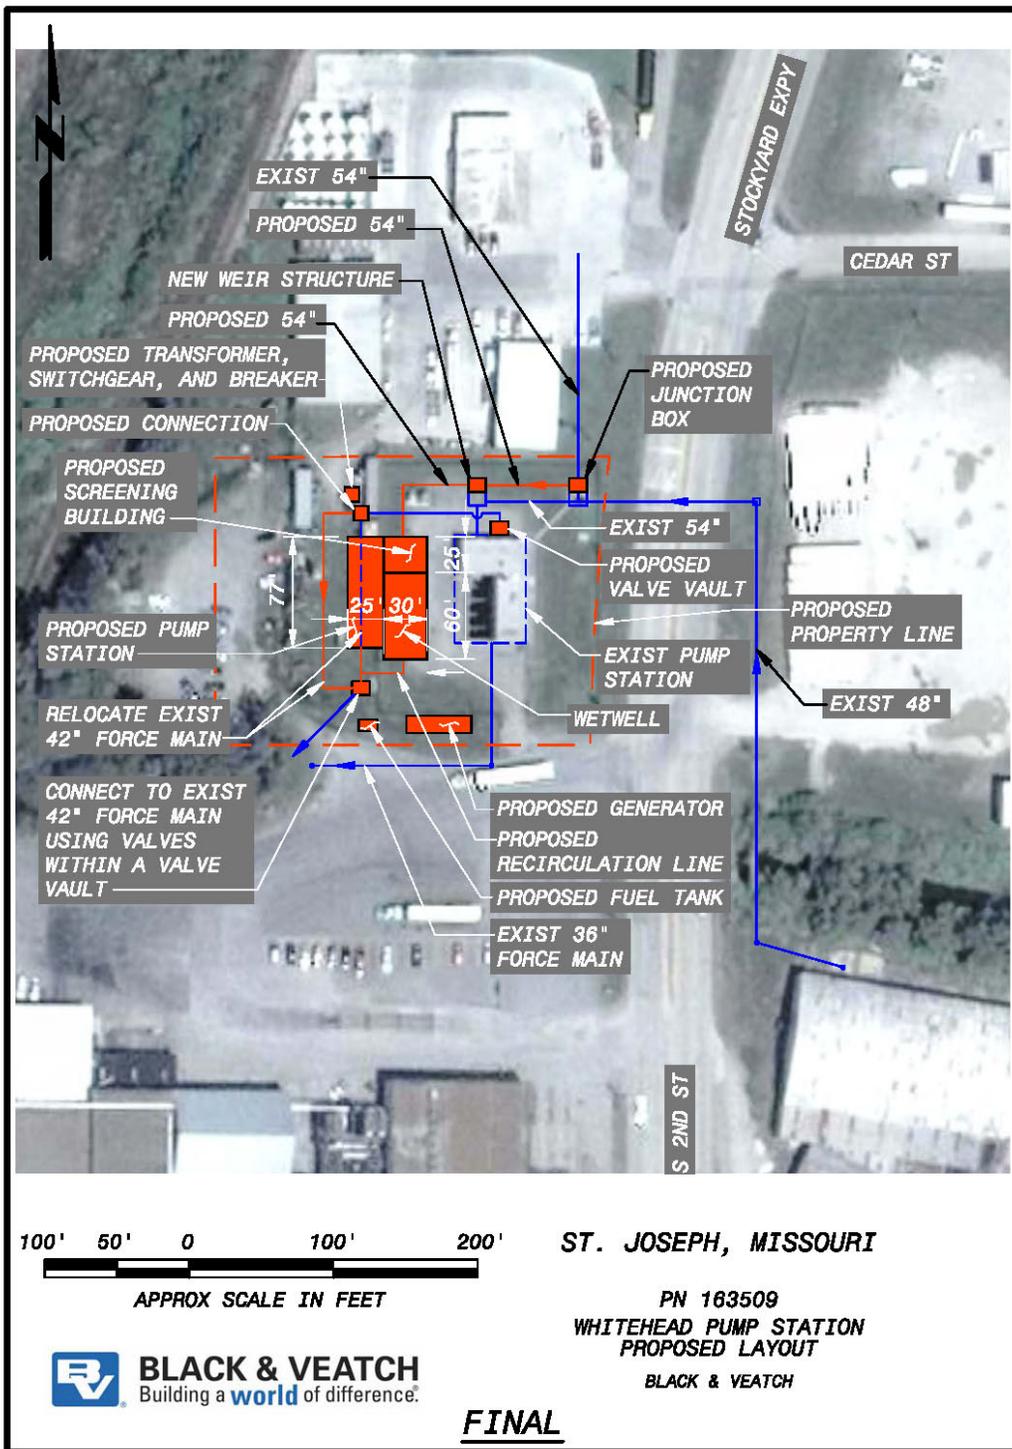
Proposed 80 mgd Whitehead Pump Station Layout
